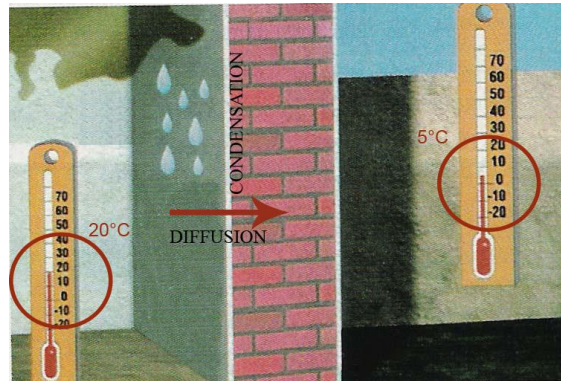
Condensation event on building exterior walls (Güzelçoban, 2007)
